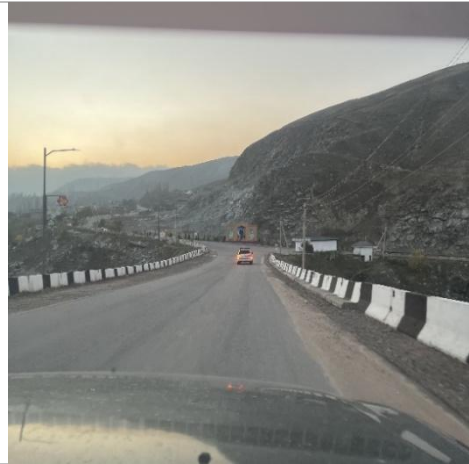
A segment showing transition zones with diminished pavement quality and fewer markings.
